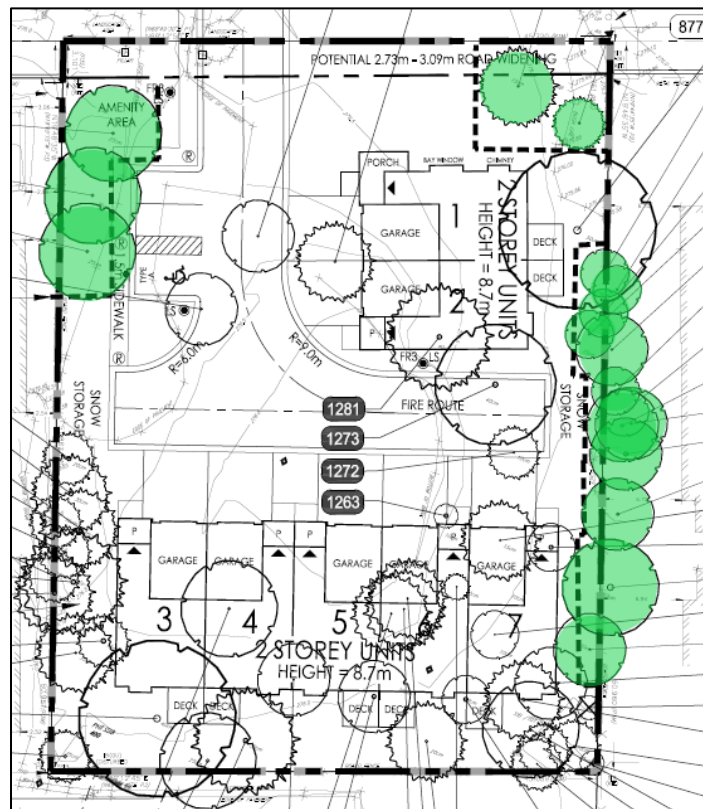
Existing Trees on the Subject Lands (Retained Trees shown in Green)
